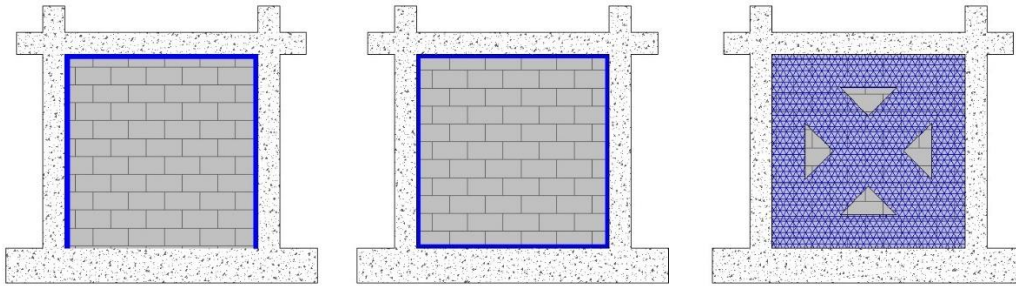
Implementation of PUFJ on Type B wall (left) and Type C wall (middle), FRPU intervention (right).
